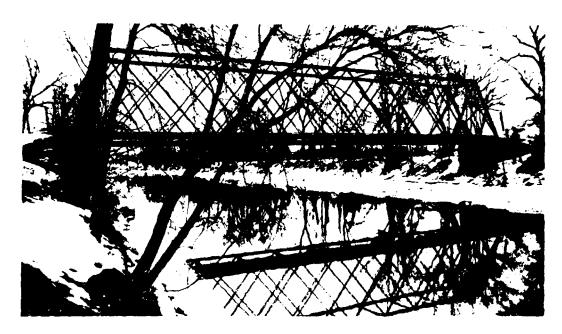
View of upstream side of Scottsville - Henrietta Road bridge, river mile point 21.70. Photo taken February 1973.
